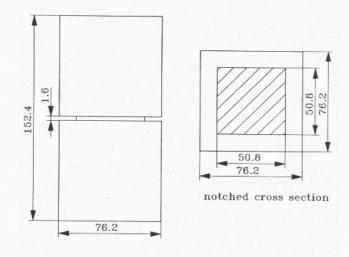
Dimensions, mm, of direct tensile test specimens
